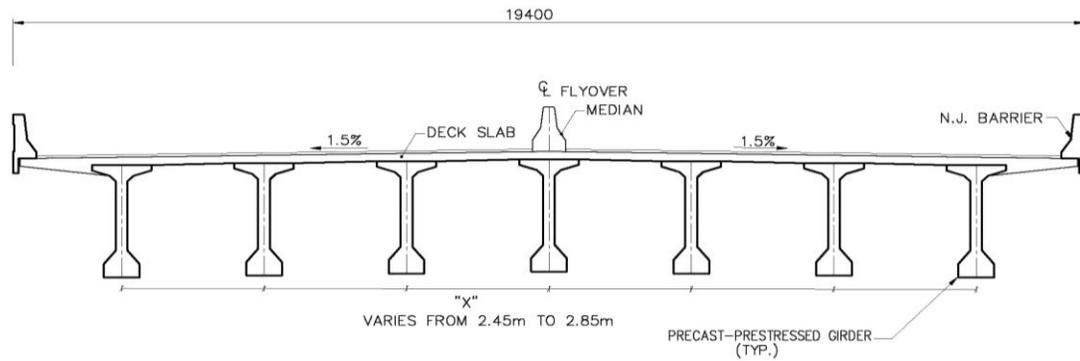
Bridge Cross Section for NHA 'Type H' I-girder Super Structure
